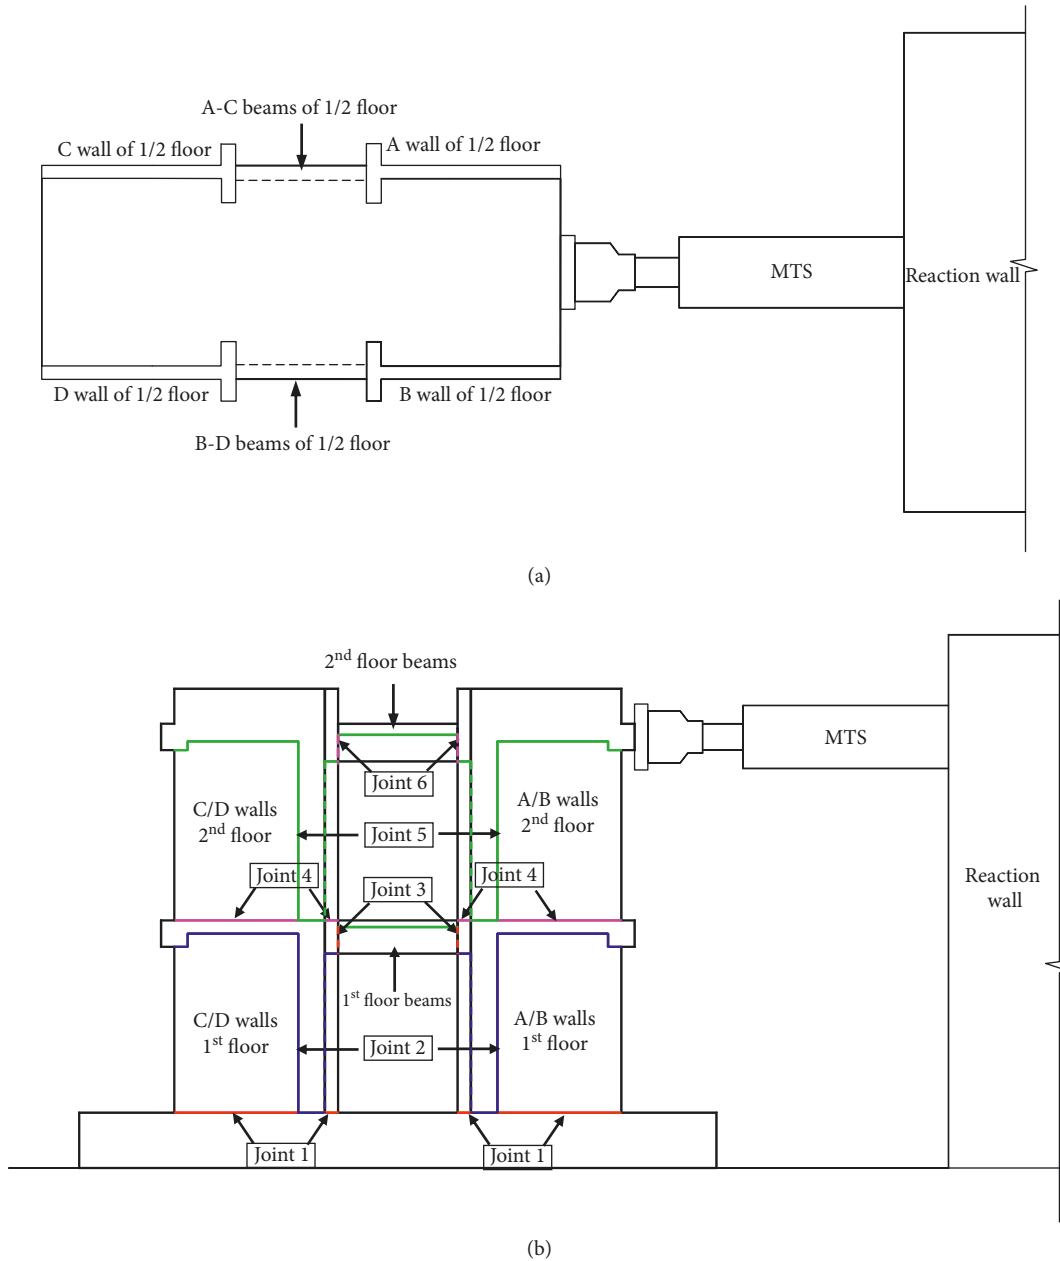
Components and joint interfaces names. (a) Plan view. (b) Elevation view. Note: Joint 1 (red) contains eight joints belonging to the flange and web area joints of A/B/C/D walls at the 1st floor. Joint 2 (blue) contains the initial and postconcrete pouring joints of shear walls at the 1st floor. Joint 3 (red) contains the beams-postconcrete pouring shear wall joints at the 1st floor. Joint 4 (purple) contains eight parts belonging to the flange and web area joints of A/B/C/D walls at the 2nd floor. Joint 5 (green) contains the initial and postconcrete pouring joints of shear walls at the 2nd floor. Joint 6 is the beams-postconcrete pouring shear wall joints at the 2nd floor.
